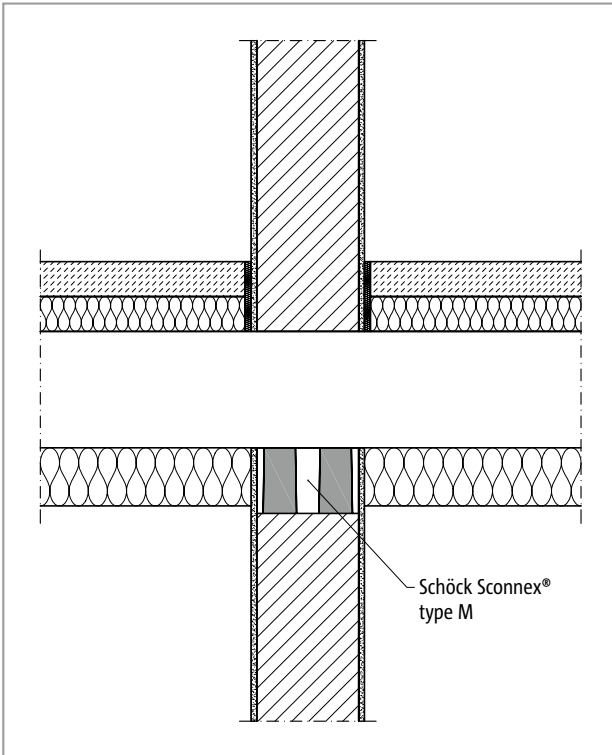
Schöck Sconnex® type M: Installation condition with interior wall and under-slab installation
